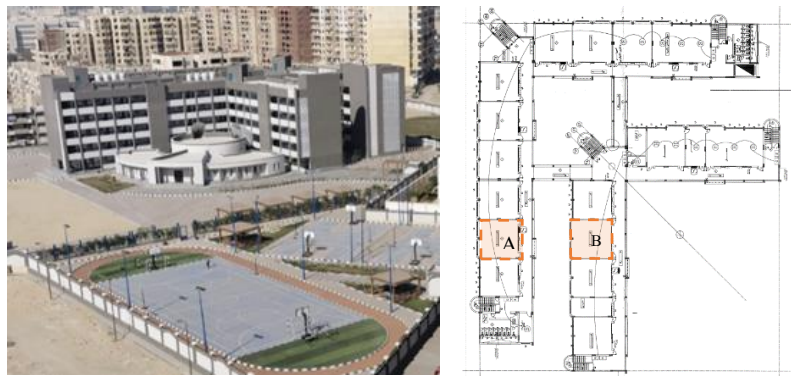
Case study building view, and Architecture plan highlighting Class A and B.
